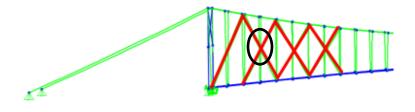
Vertical Bracing Pattern at Ends of 40 m Span Footbridge
